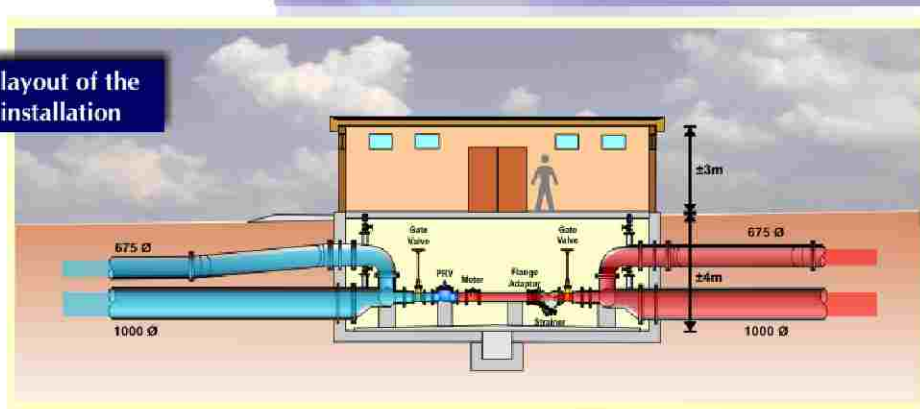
Elevation layout of the Sebokeng/Evaton installation
